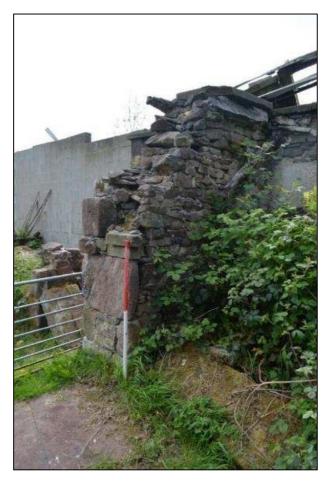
(Shot 112): West part of Building 8, looking southeast (1m scale)
